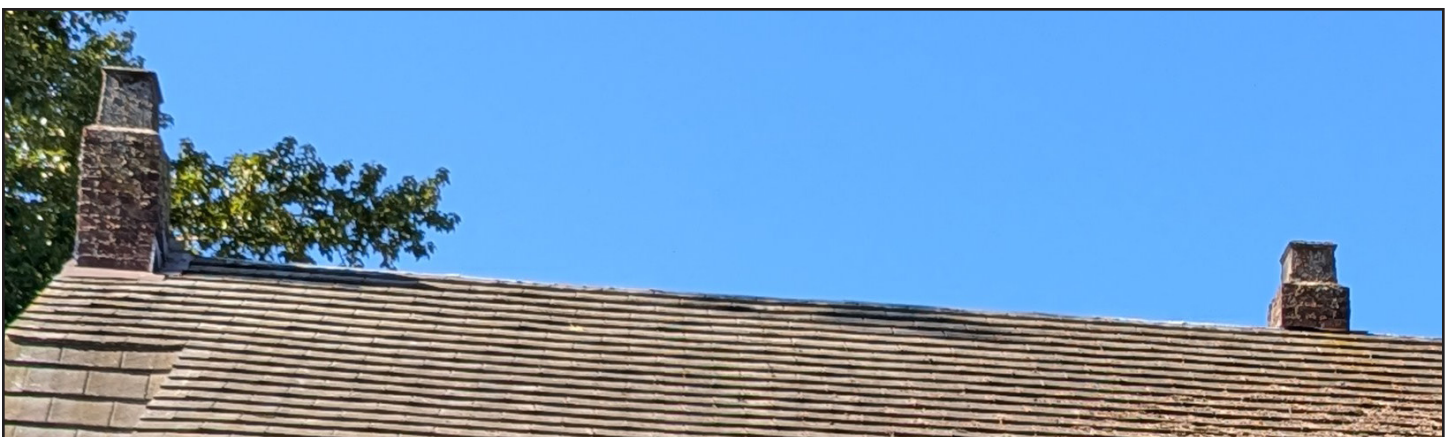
View of the two brick chimneys above the roofline, 2025, showing their fair condition, particularly the one in the middle of the roofline. (Source: Cummer)
